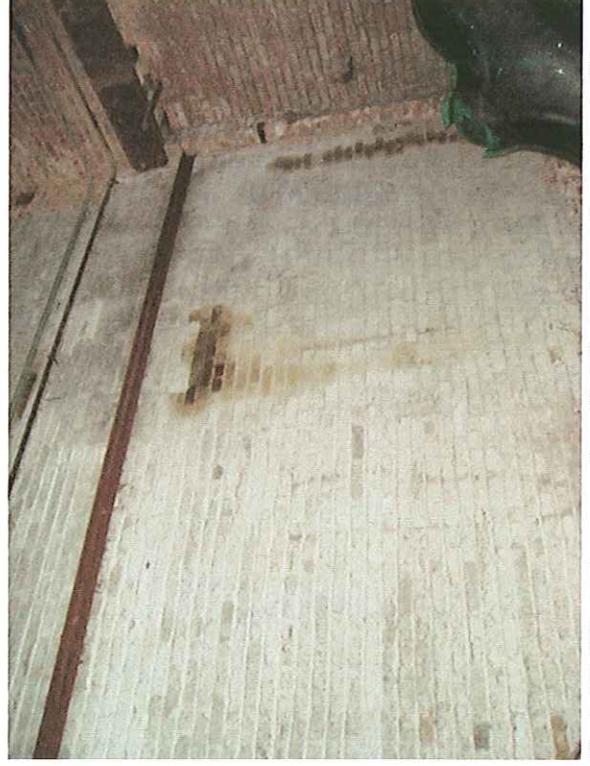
Oil staining on north wall of Room 1 near the east end of the room.
